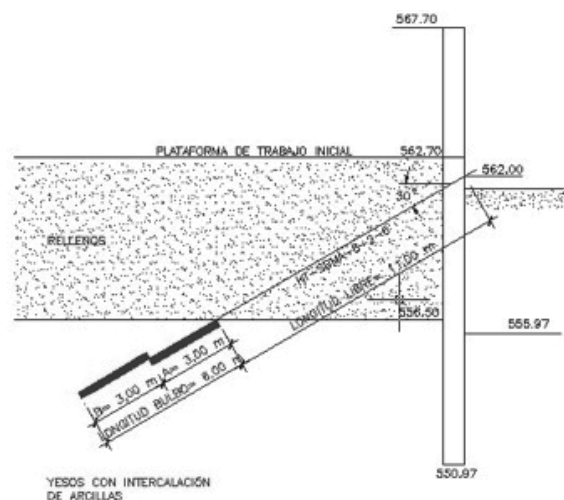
Section of diaphragm wall with trial anchor test TA2.
